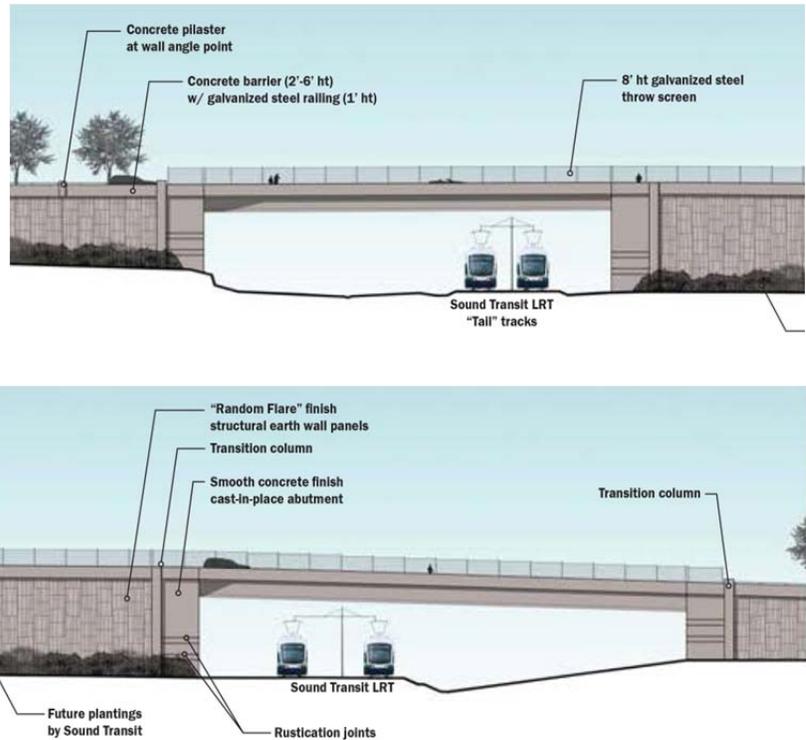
Spring Boulevard Bridge elevations seen from the south
